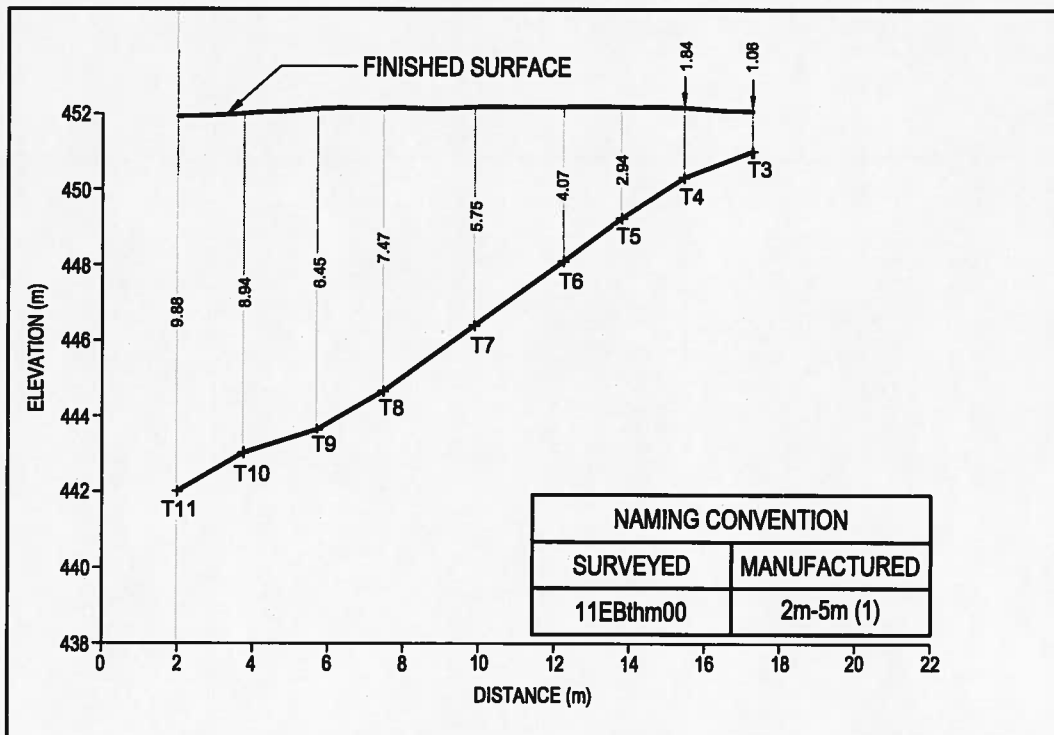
11EBthm00 (2m-5m (1)) - AS MANUFACTURED, PLAN, AND SECTION
